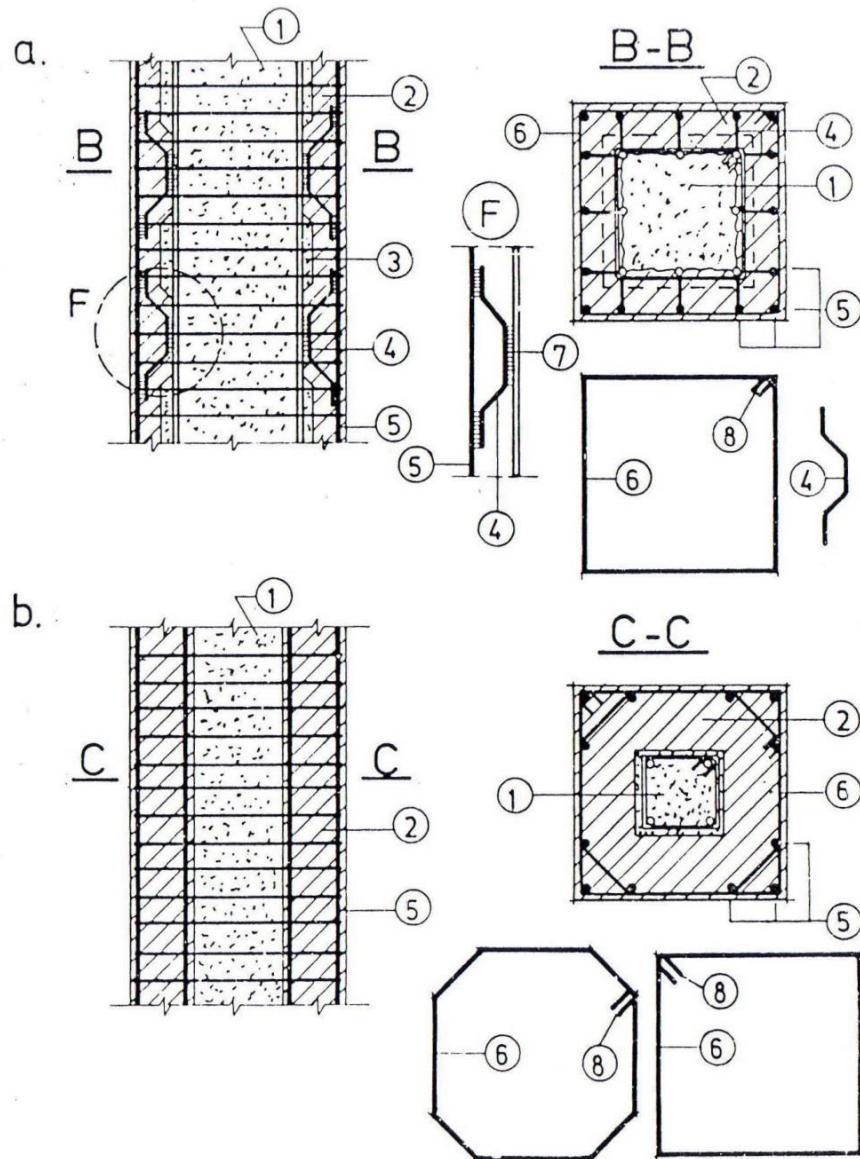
Connection of the old to the new reinforcement of the R/C jacket: a) protection of new bar against buckling with welding; b) protection of new bar against buckling with octagonal ties; 1-existing column, 2-jacket, 3-key, 4-bent bars, 5-added reinforcement, 6-ties, 7-welding, 8-alternating corners), (P.Gavrilovic [15])
